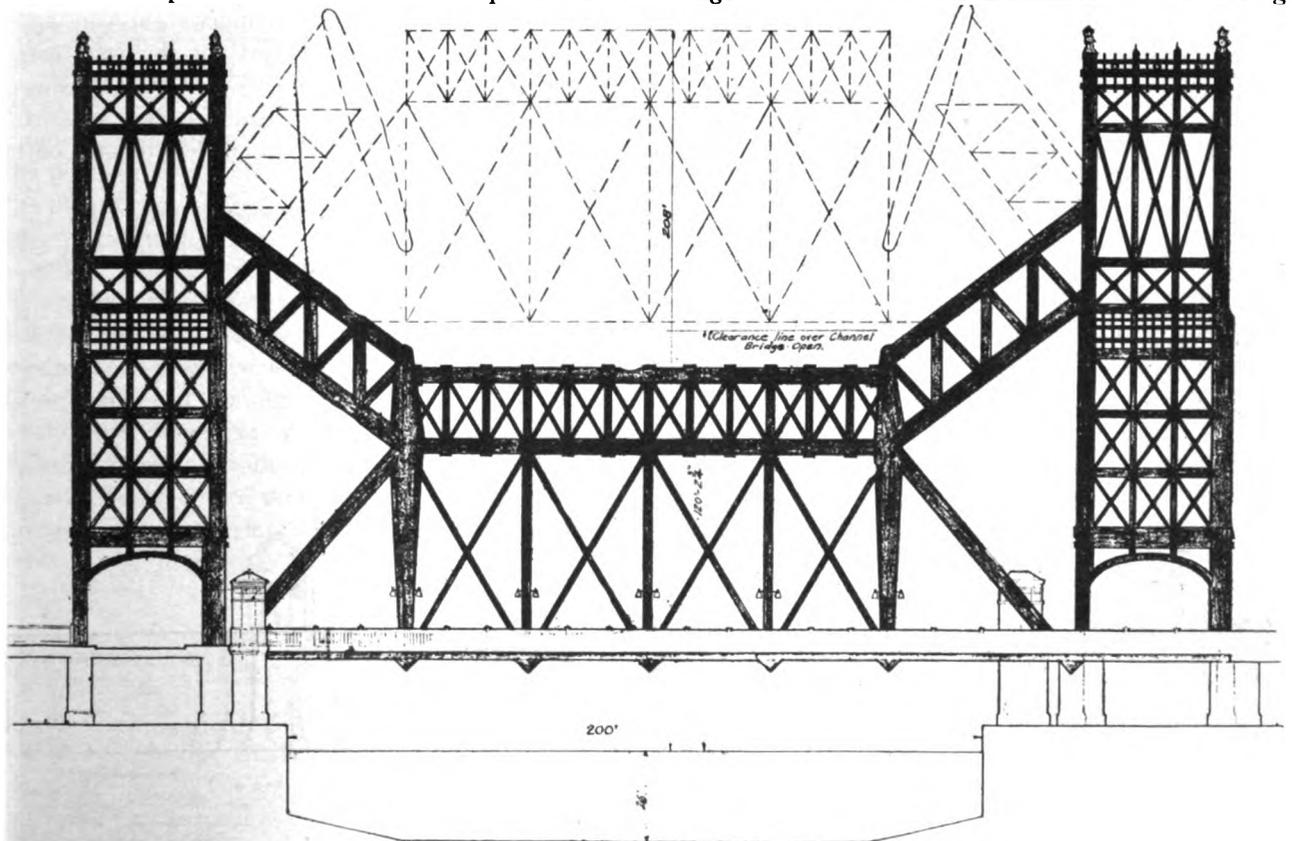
Lift Bridge, Old Scheme, Over New Channel.
